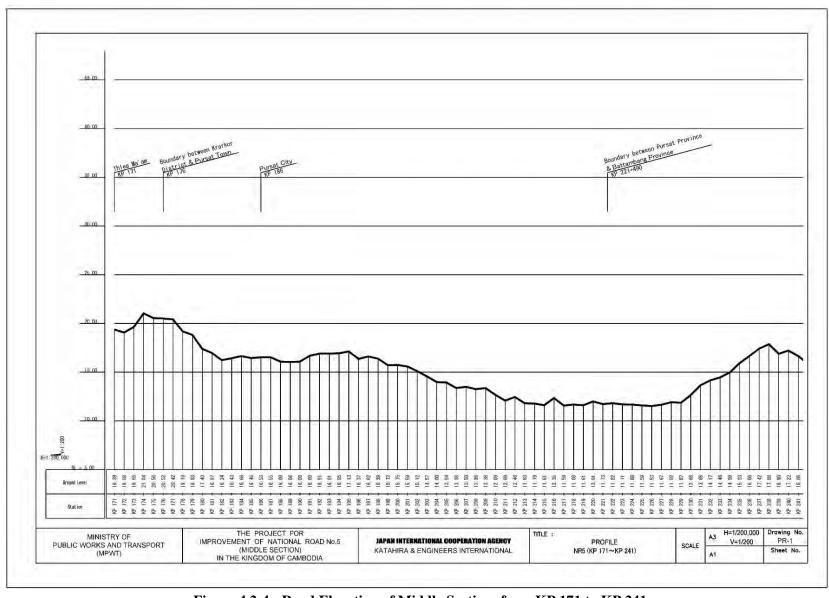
Road Elevation of Middle Section: from KP 171 to KP 241
